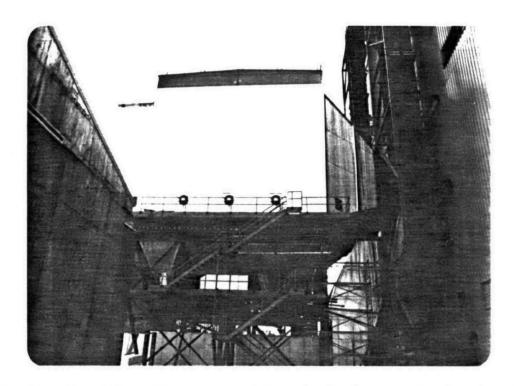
View from ground level facing west showing the ESP for Boiler 8.
